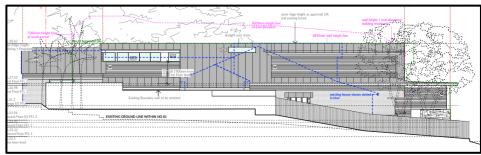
Eastern Elevation (s4.55 plan set, dated March 2021)
